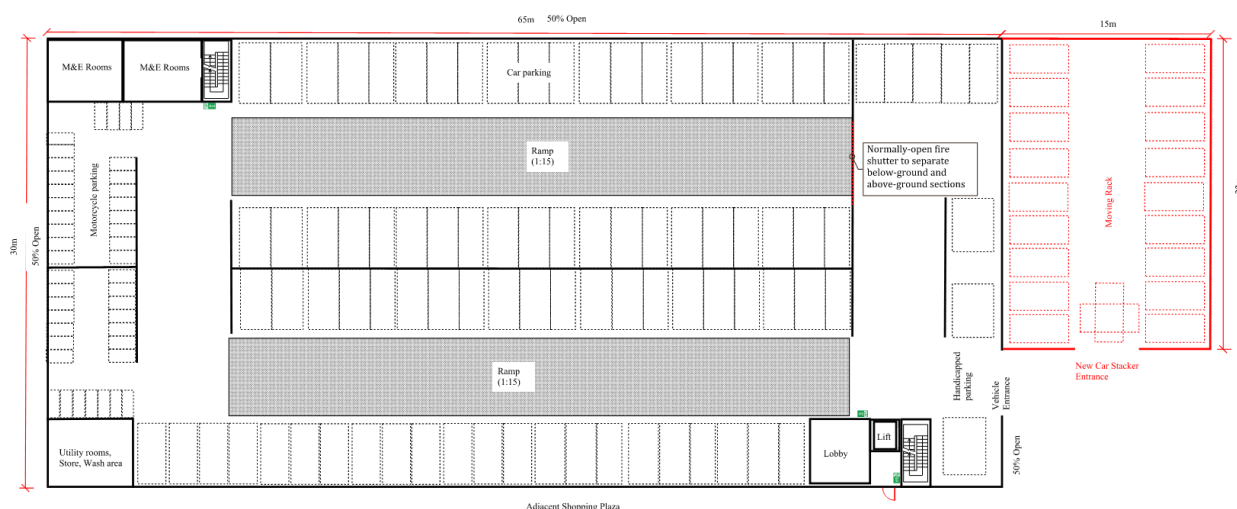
New Car Stacker Configuration Plan (Ground Level)
